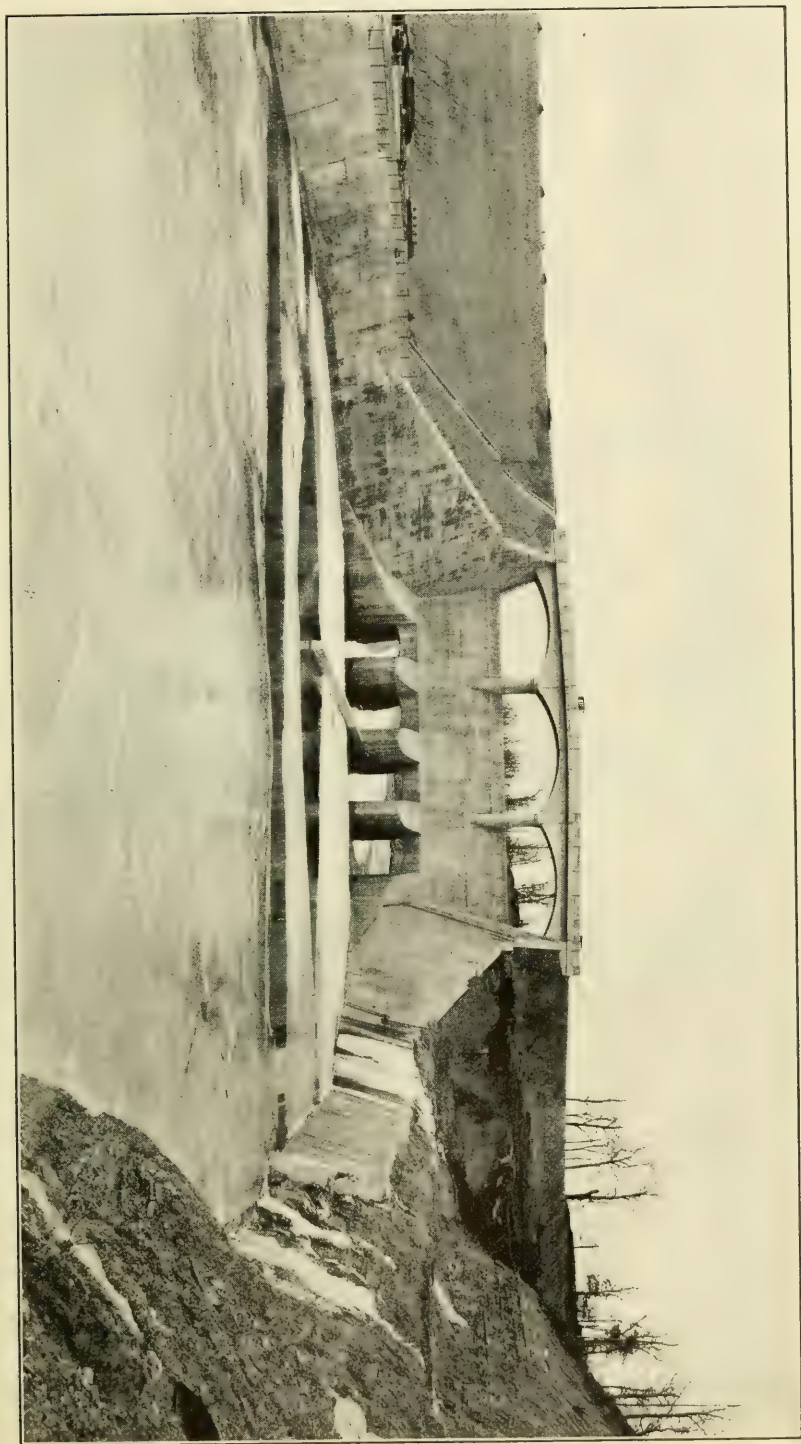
OUTLET AND SPILLWAY STRUCTURE, TAYLORSVILLE DAM.
